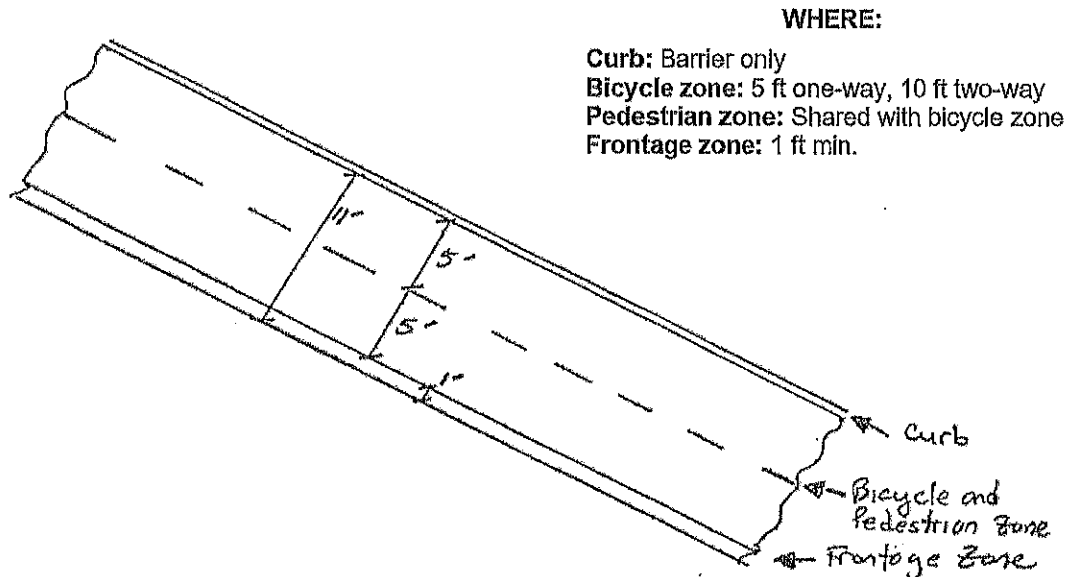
Pre-Approved Design for Sidewalk with No Planter Zone.
